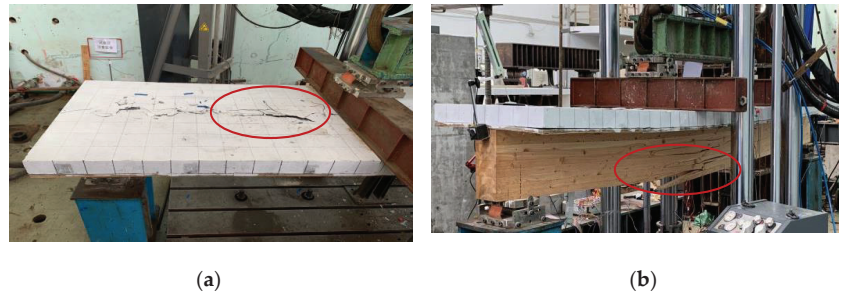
Failure mode of composite beam specimen. (a) Cone failure of concrete slab, (b) Tensile failure of glulam beam.
